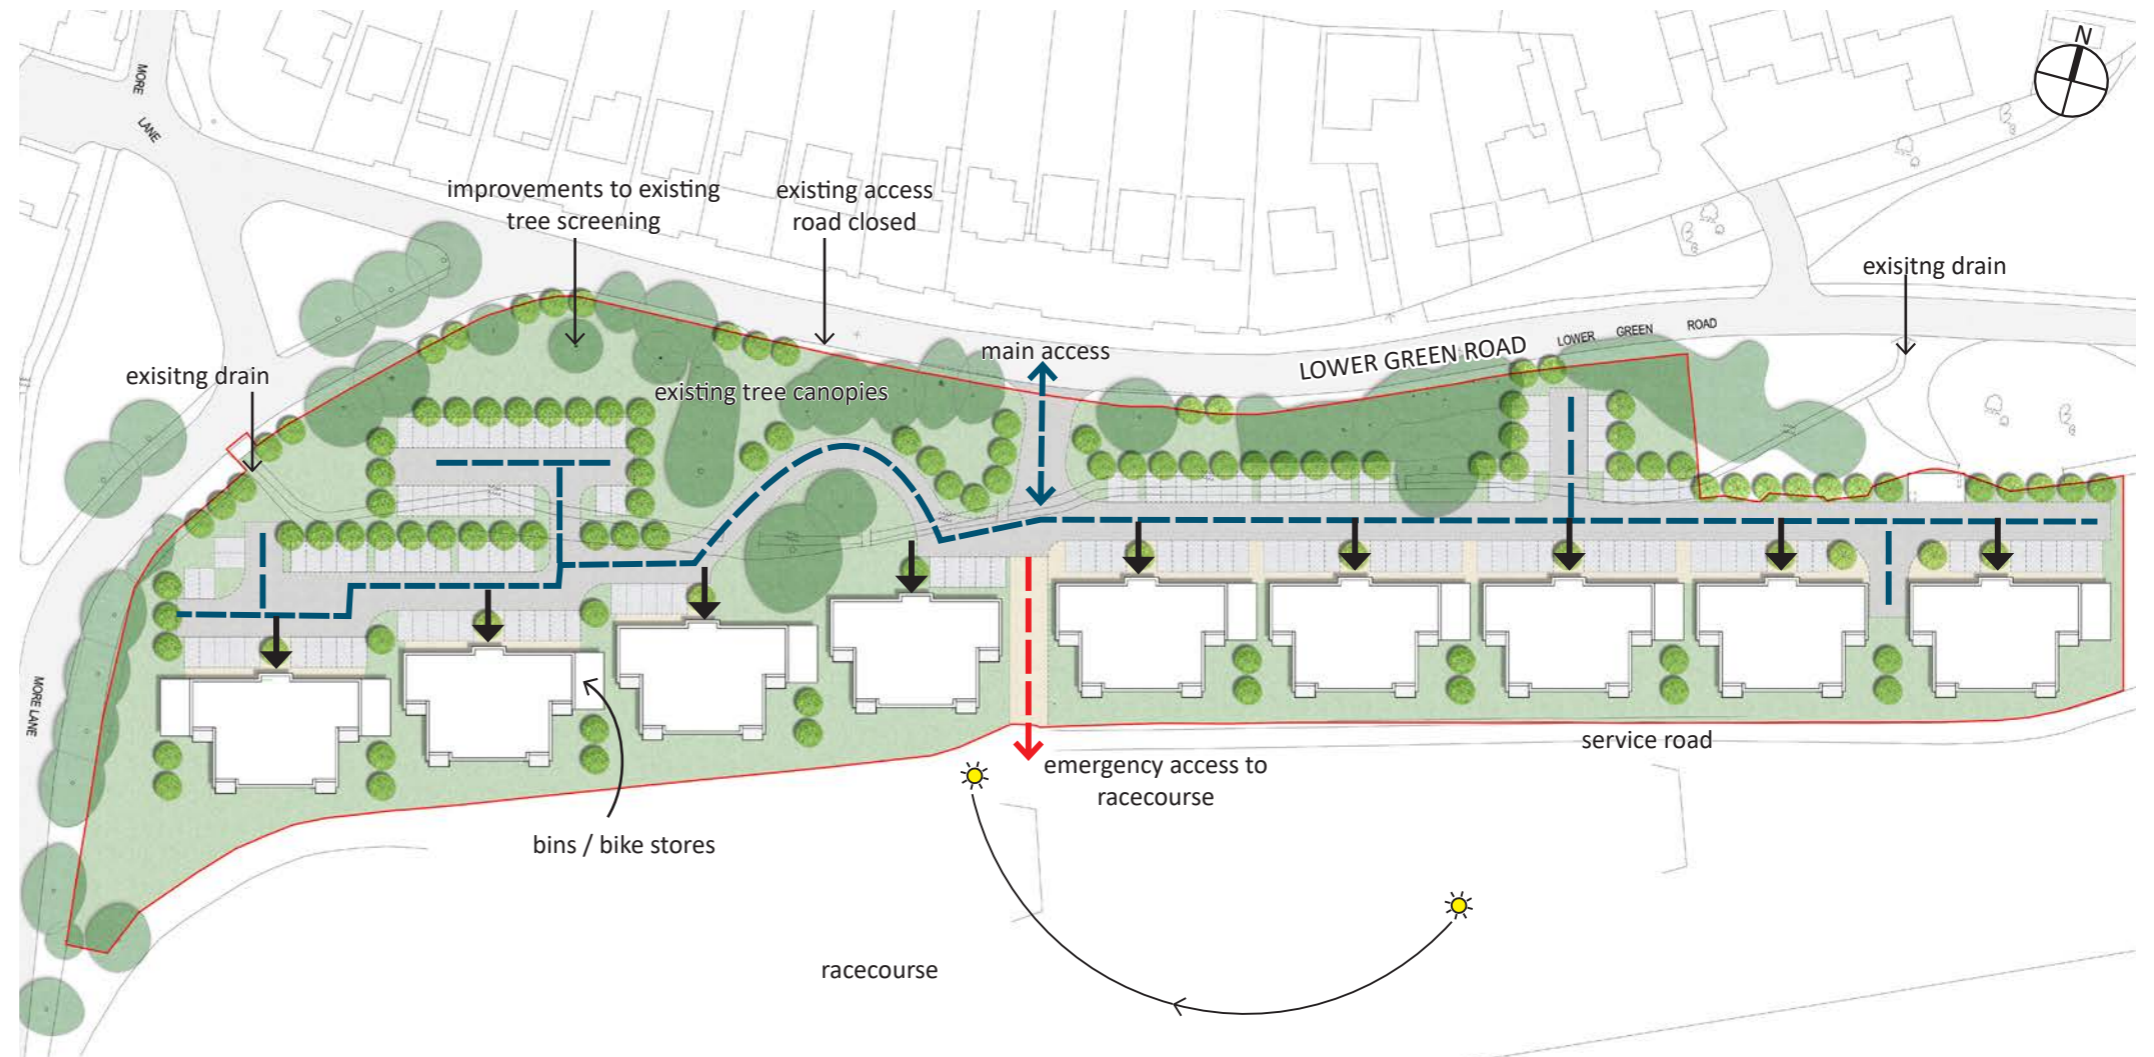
Illustrative Layout for Site 3 - Villas Residential
